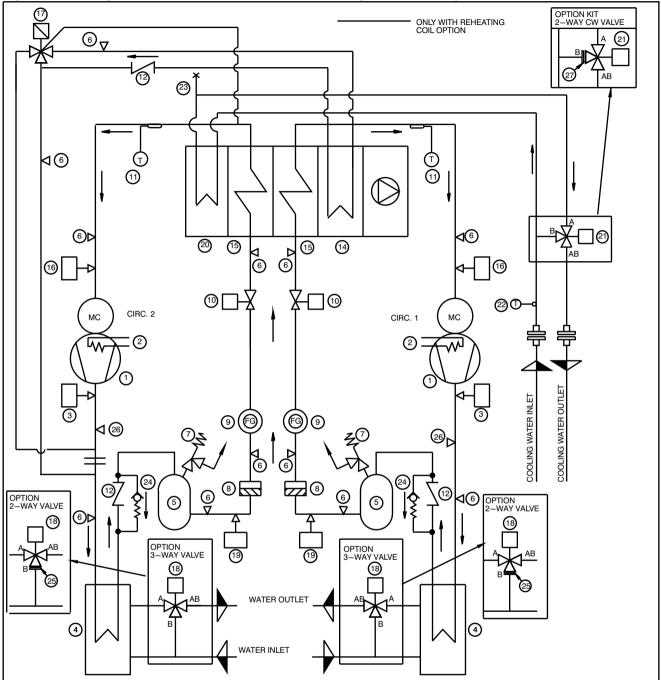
Refrigerant circuit H version - Dual circuits - Single SCROLL compressors - TXV
